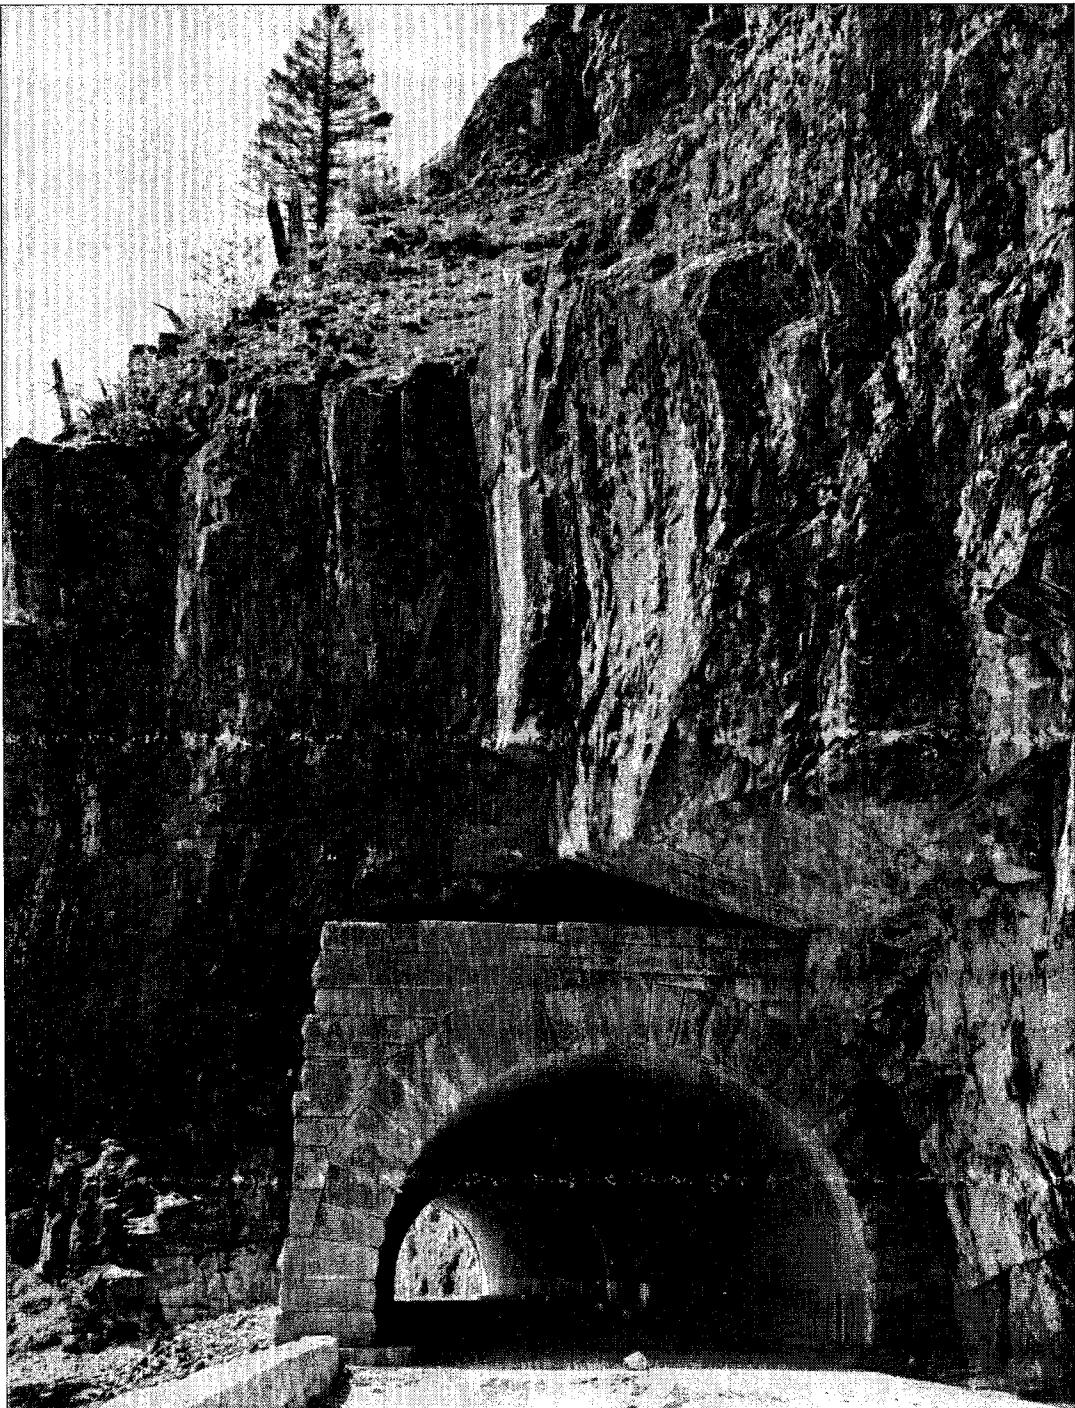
Historic photo Stevens Canyon Tunnel with ashler stone portal and concrete lining, 1950 (MORA Archive).
